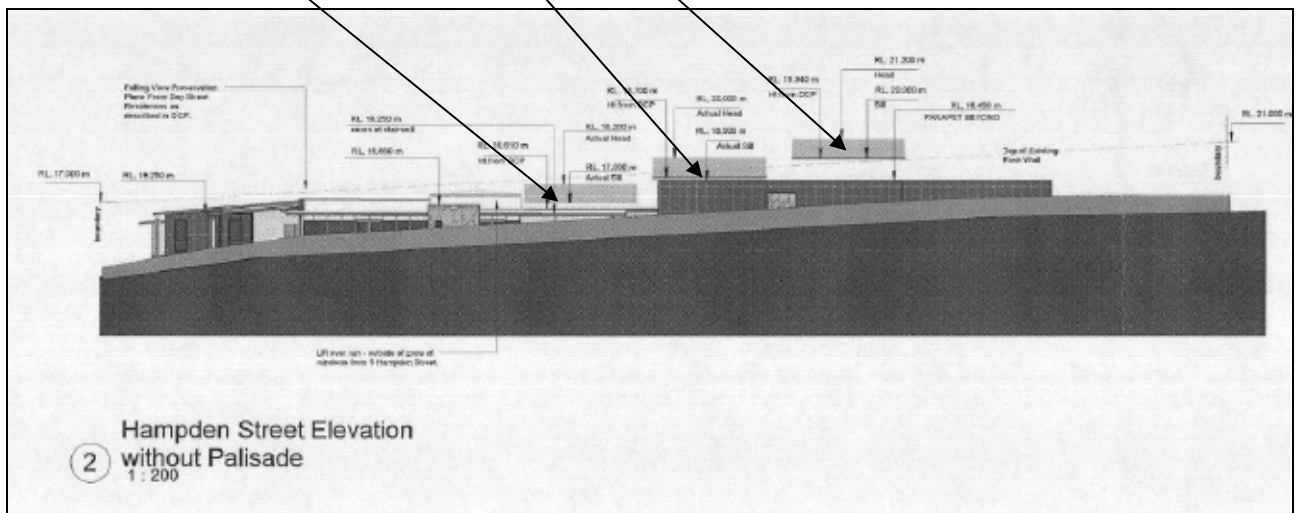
Architectural plan indicating that the proposed development is located below the three (3) view preservation planes which ensure that views across the site are maintained from the dwelling houses located at 1, 3, and 5 Hampden Avenue.
